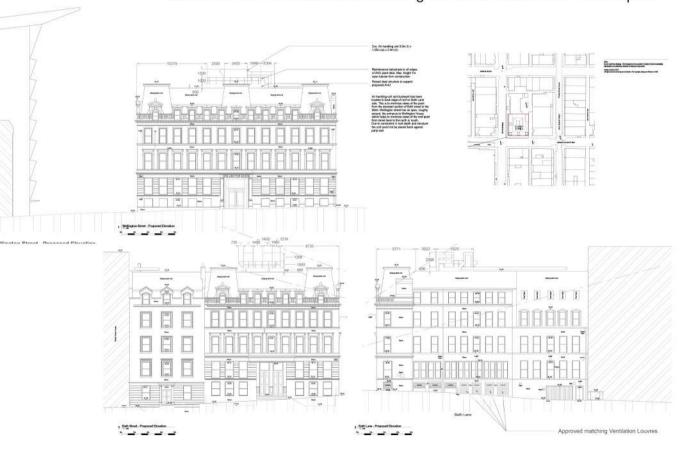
shows the proposed arrangement of the plant on the roof, which incorporates the installation of a 5m x 8.6m deck, on a 600mm plinth with a 1m balustrade around this and then the installation of 2no air handling units above, to be installed on an area of modern felted roof with chippings over.
